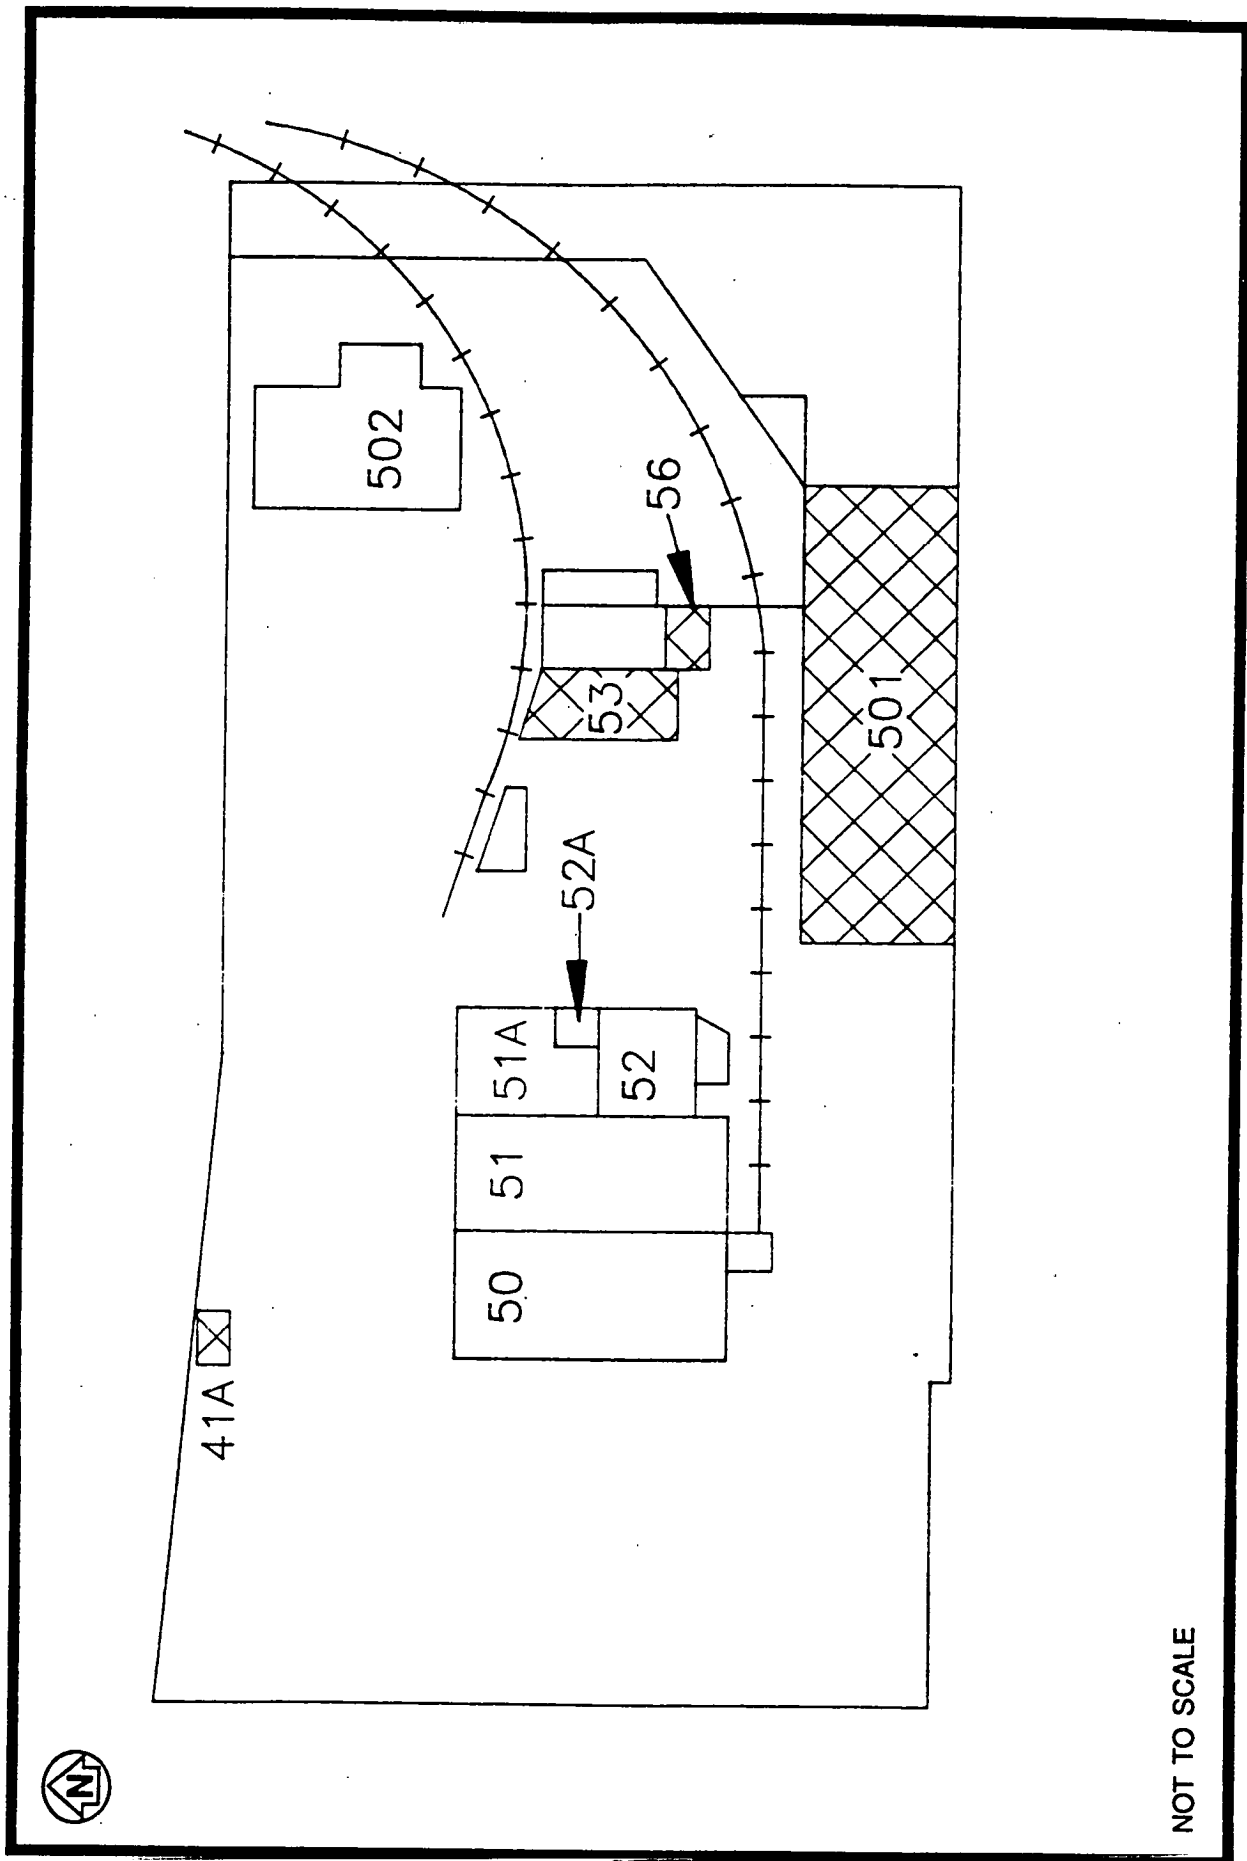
LOCATIONS OF ADDITIONAL ROOF SURVEYS AT PLANT 2
